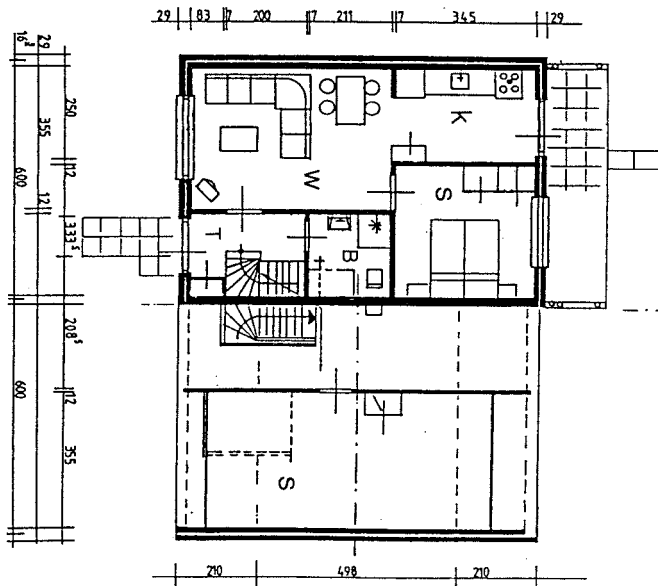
Floor plans of one-family homes in Oosterhout - original design (non-adaptable)
